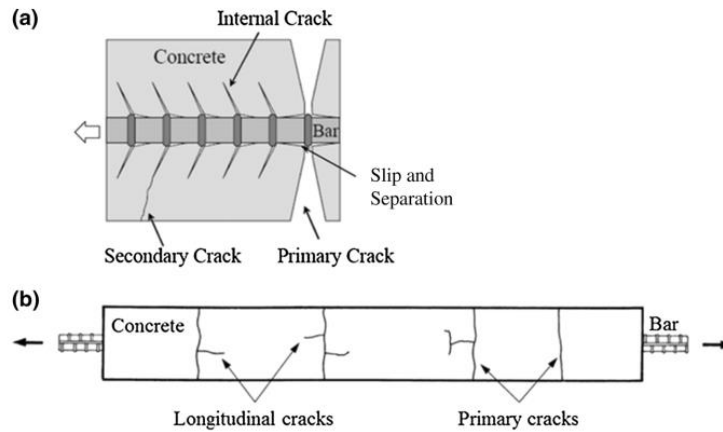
Schematic illustration of damage and cracking at steel-concrete interface [69]
